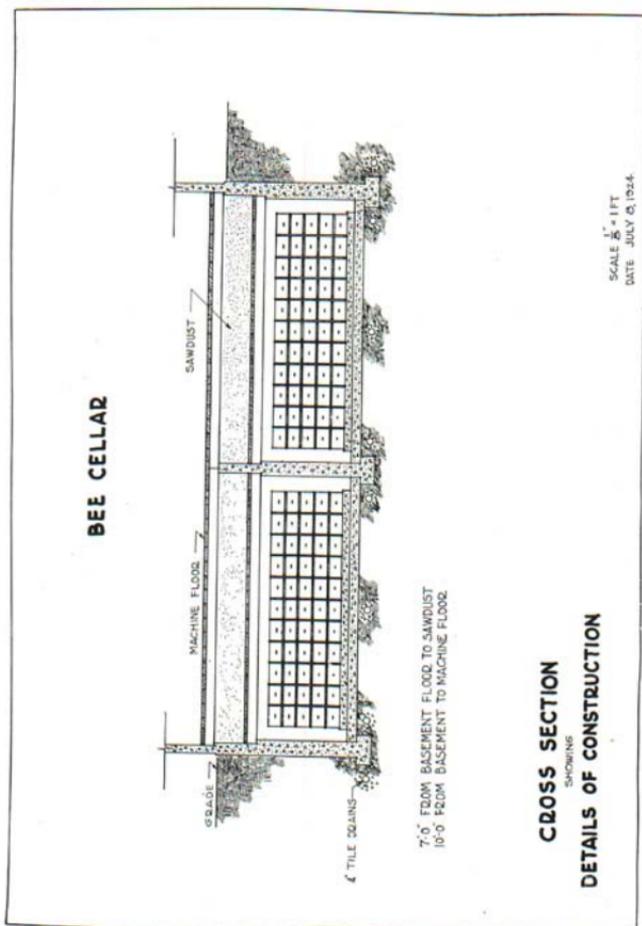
Cross-section showing details of construction of a bee-cellar.
